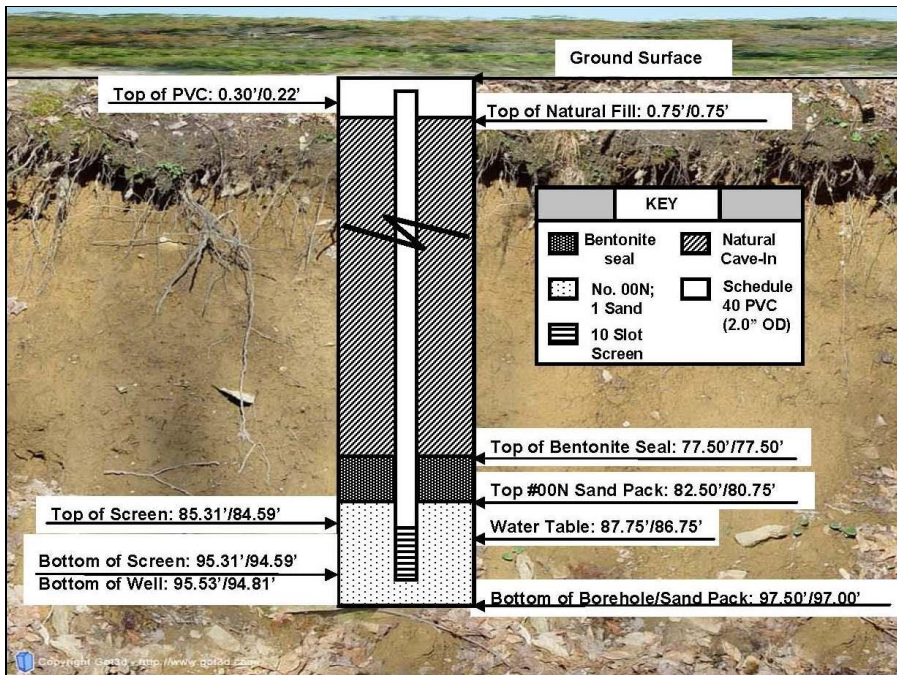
Groundwater Monitoring Well Typical Construction Details
